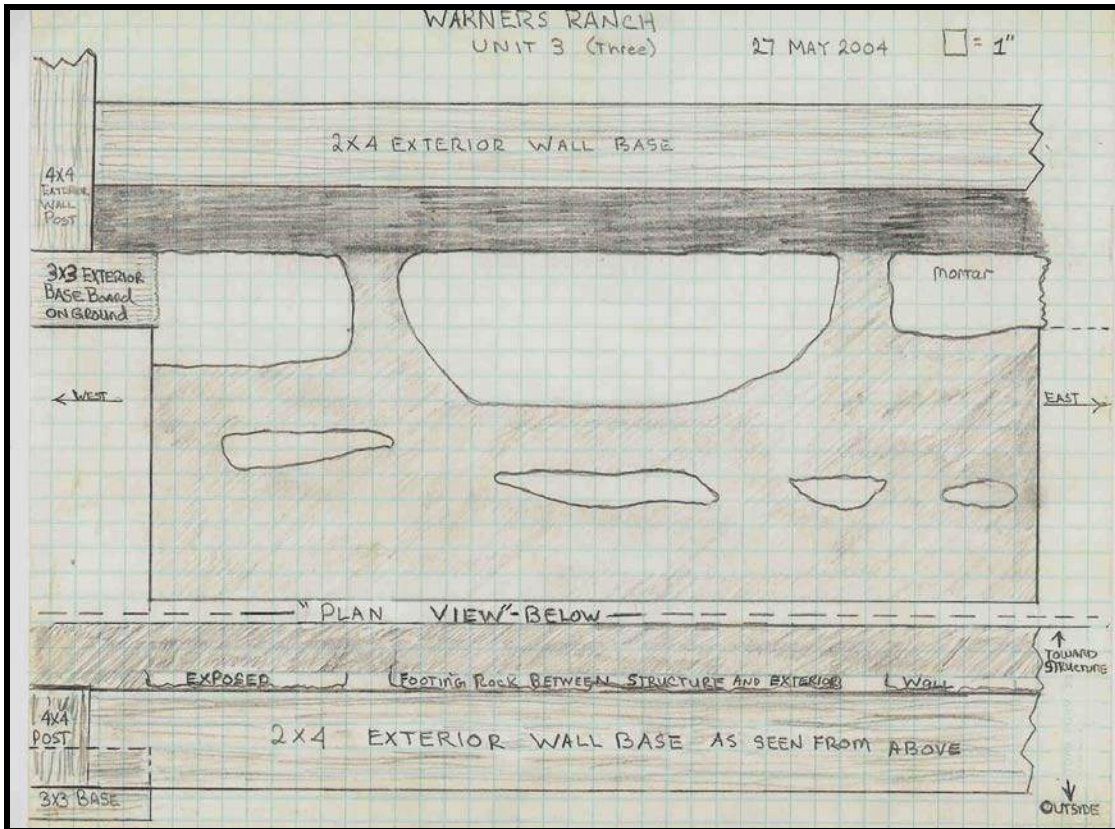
North side wall profile and partial plan view of Unit 04-3, placed beneath the south wall of Room 102, showing undisturbed foundation stones.
